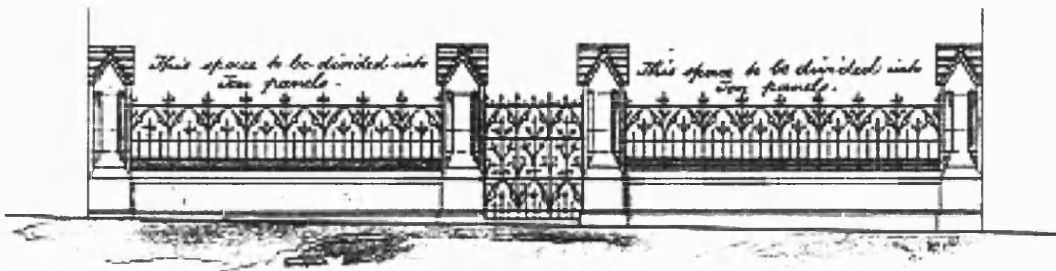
Gates for the Walcot Street Cemetery which stood opposite St. Michael's Church and under the north end of the present shopping centre. J. E. Gill. Drawing, signed Manners & Gill 5 Sept. 1864.
